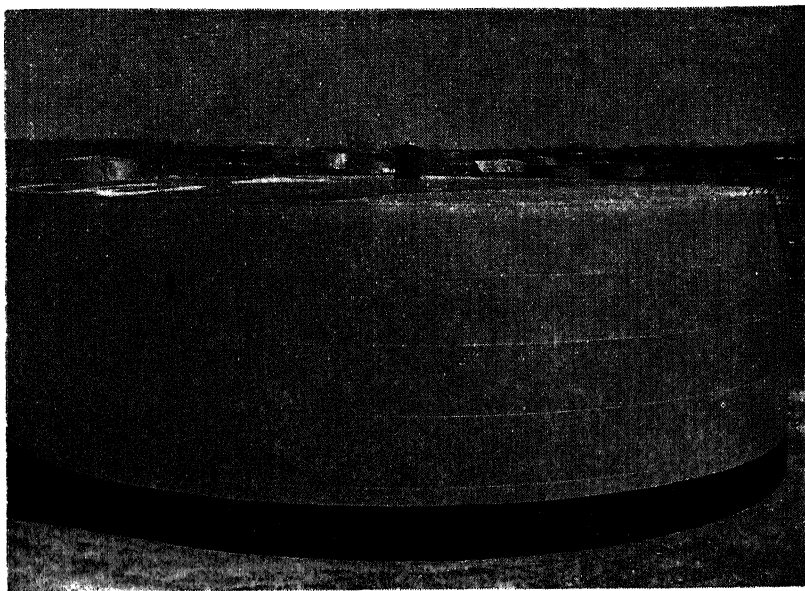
One of four 80,000 bbl. oil storage tanks with Wiggins breather roof. Diameter 120 ft., height 40 ft. All welded steel construction.
